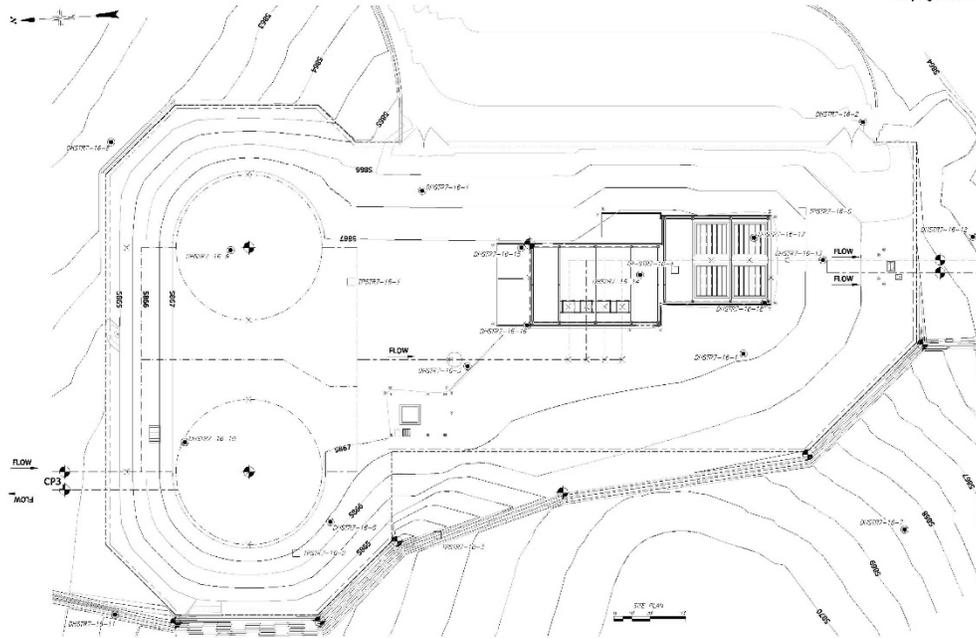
Plan view showing drillhole and test pit locations (final surface shown)
